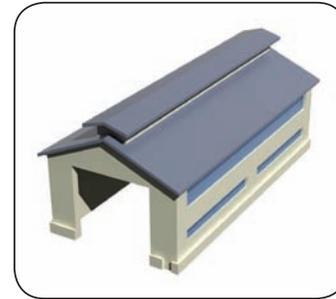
'Traditional Roof Form' Best Practices – Chow Low Hammond Architects
